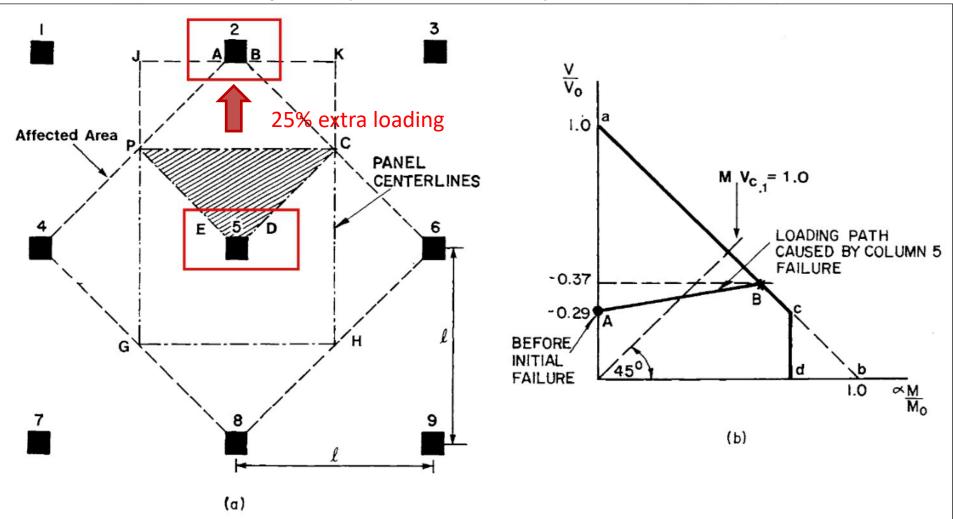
Propagation of punching failure for typical interior slab-column connection
